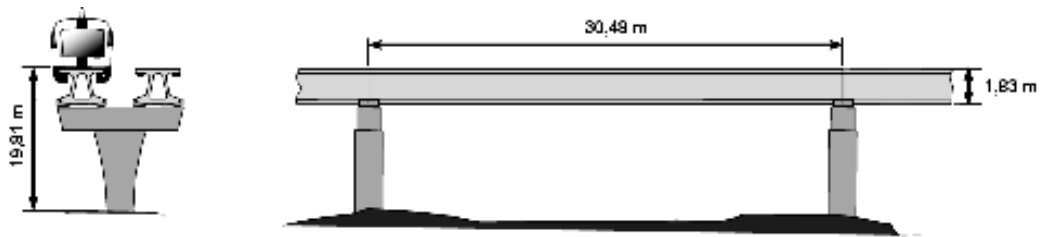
Elevated-guideway configuration: Type A - single column [7]
